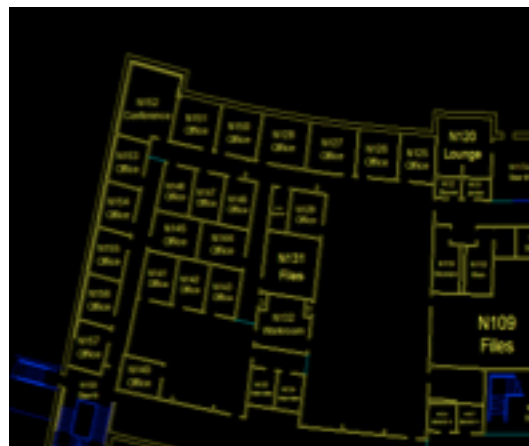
CAD graphic – section of main level building 1 of 4. Due to data privacy, a complete floor plan could not be displayed.
